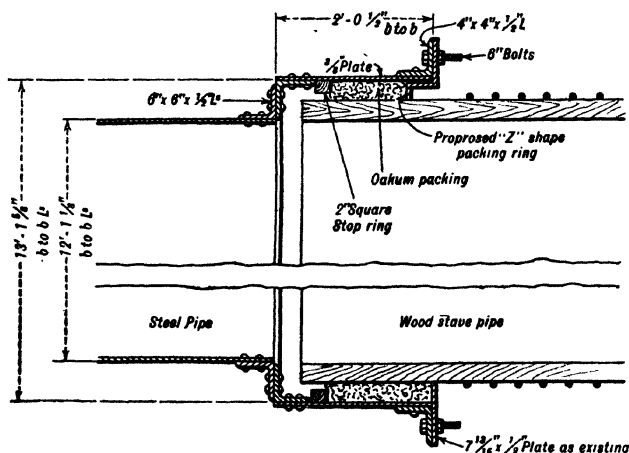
Detail of Trenton Falls Expansion Joint at Junction of Steel and Wood-stave Pipe Lines. Utica Gas and Electric Co.
